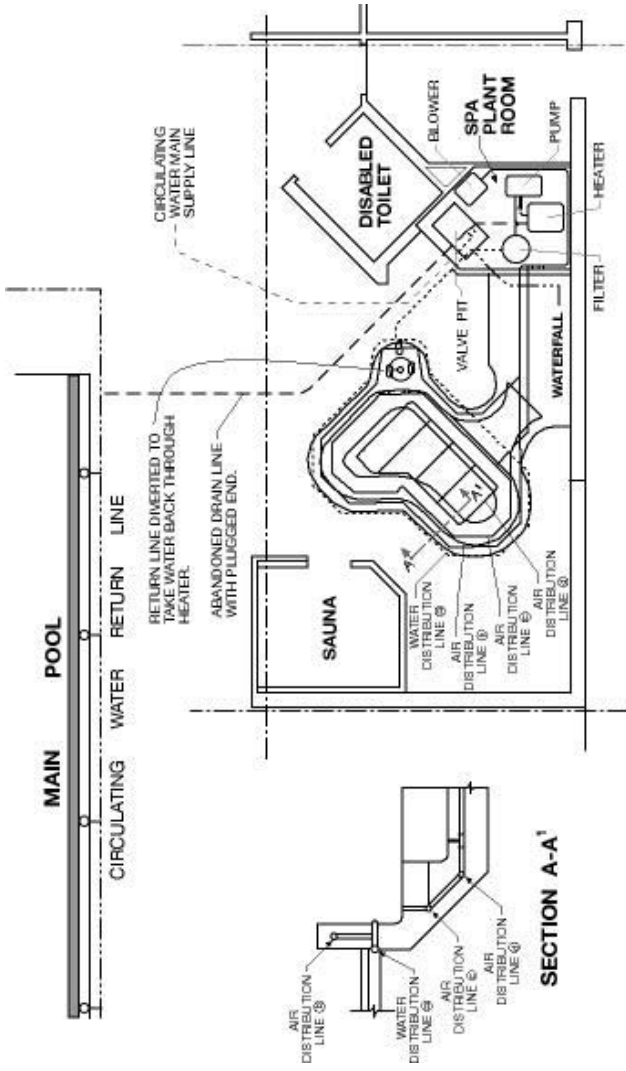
Typical layout of a spa and sauna. Source: John Schlaftrig and Mel Rowe.
